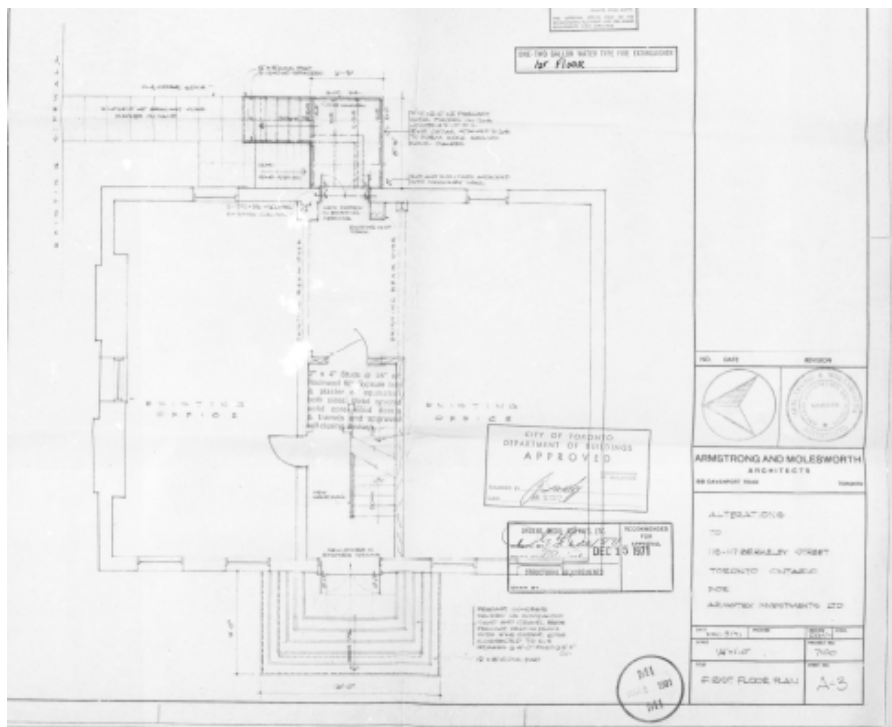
1971 ground floor plan drawing by Armstrong & Molesworth showing the centre hall plan of the house at 115 Berkeley Street and new front stair addition (Building Records)
